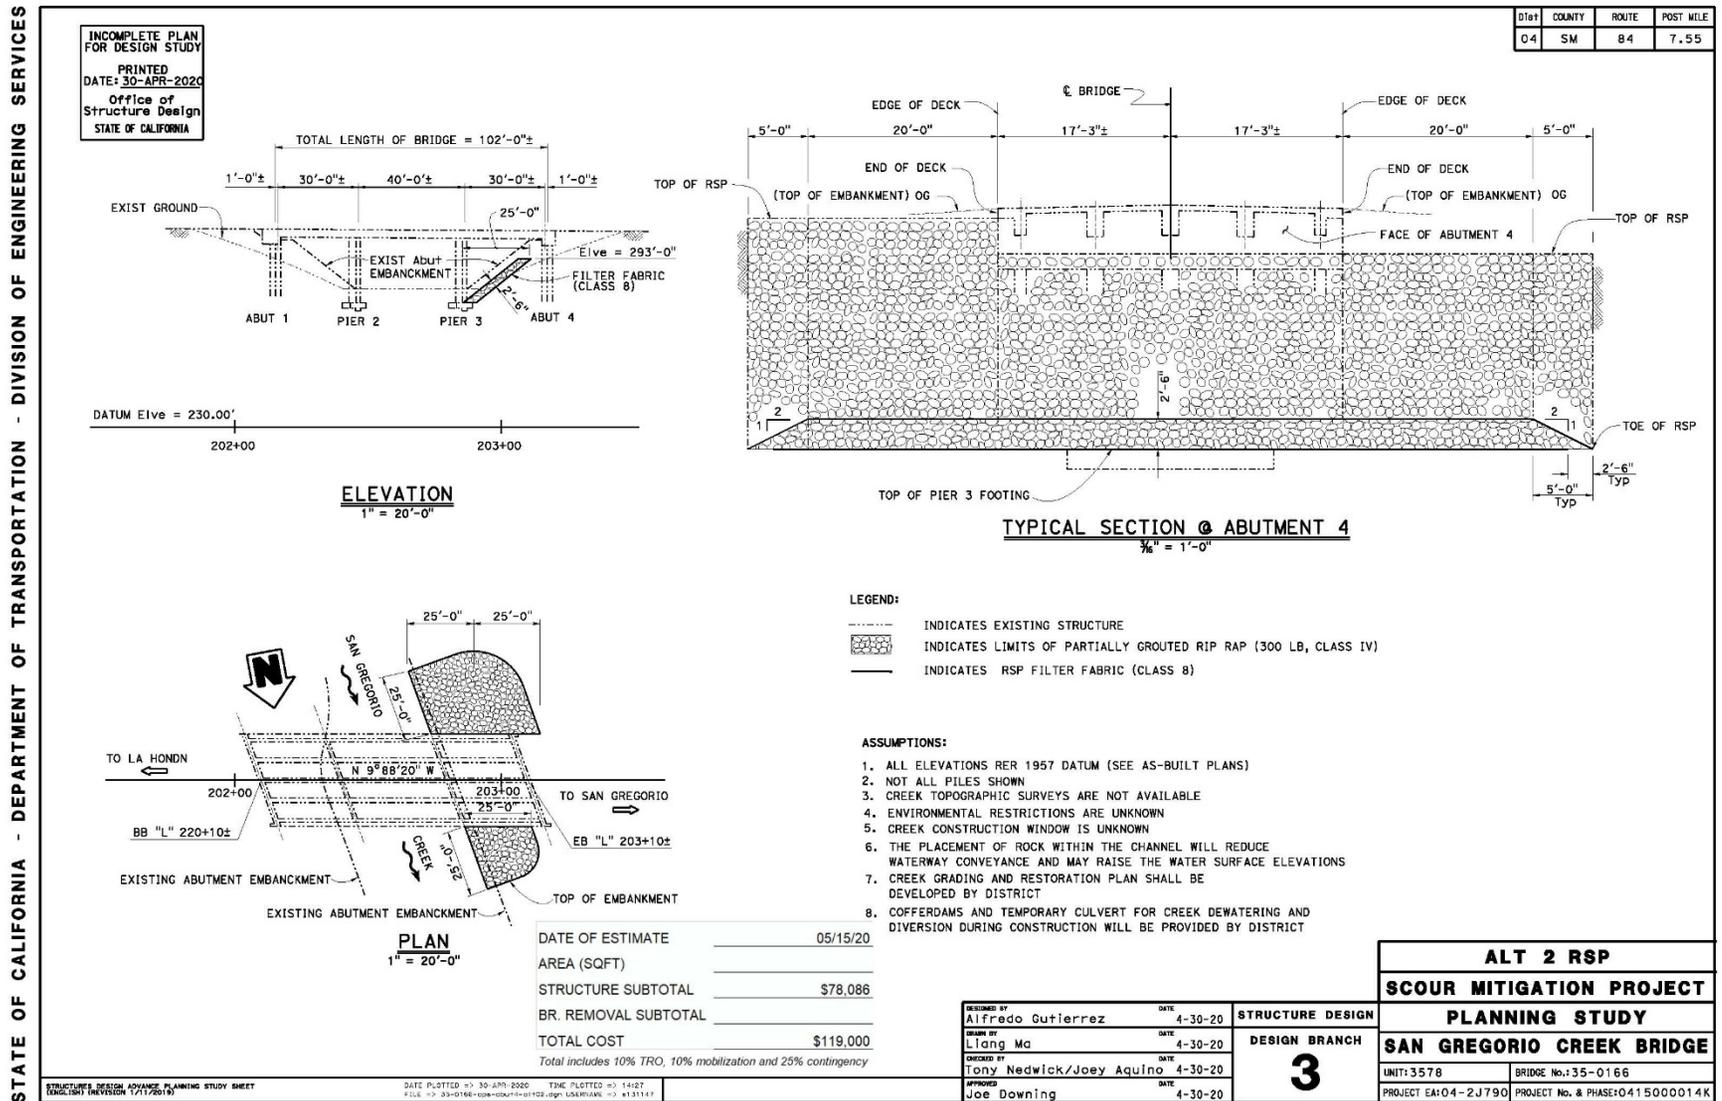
State Route 84 at San Gregorio Creek Bridge Draft Project Layout
